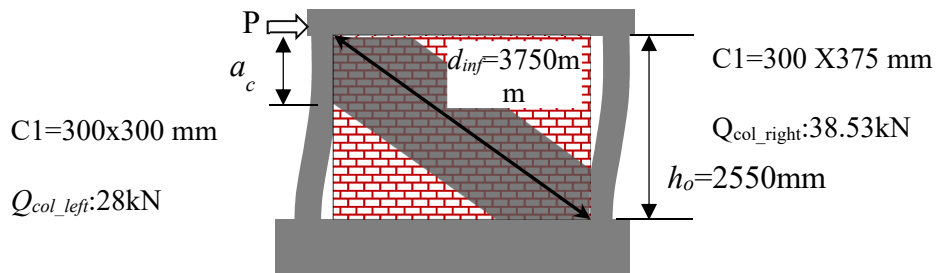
Masonry Infilled RC Frame W1
